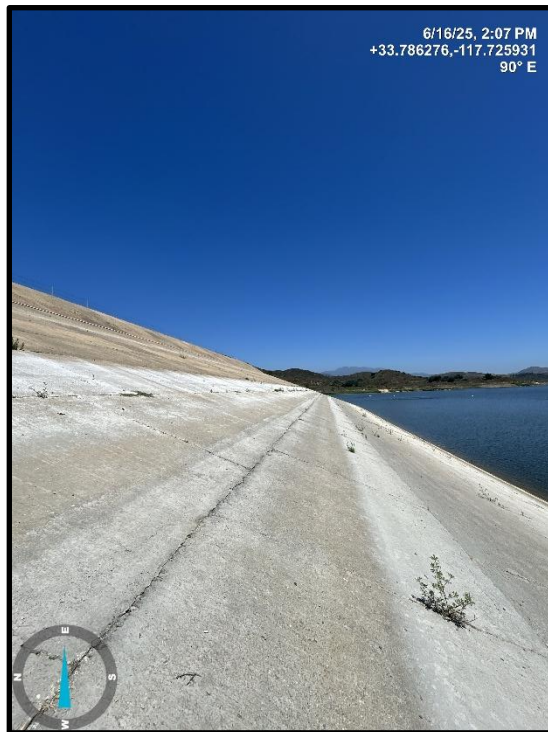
Upstream face looking towards right abutment. Note minor vegetation in panel joints.
